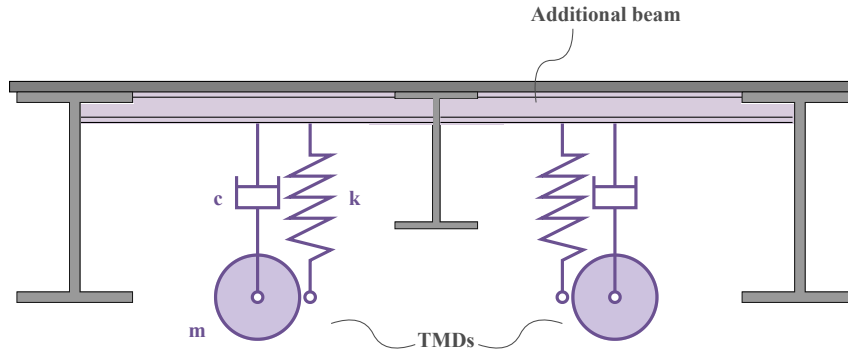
Schematisation of the cross-section of the bridge the TMDs and their additional beam.
